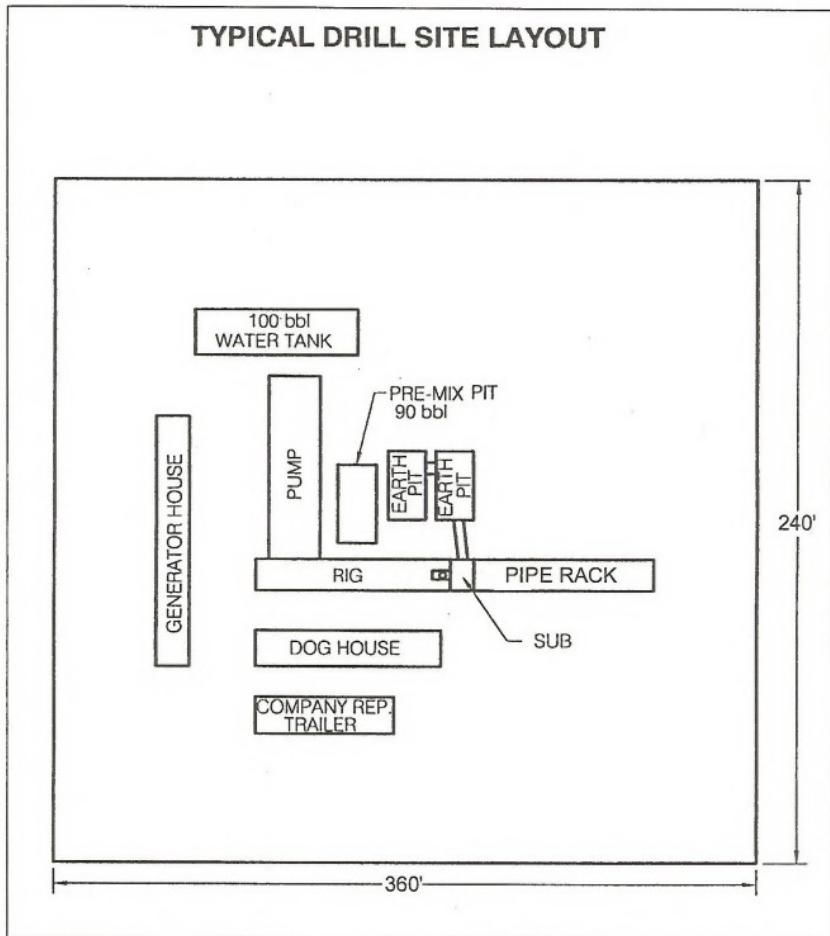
Typical Drill Site Layout – Atlantic Rim Natural Gas Project
